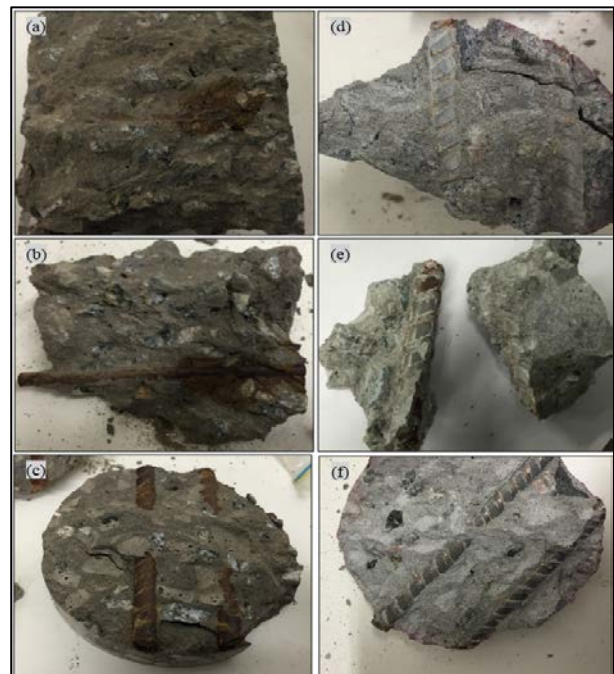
Rebar interface and reinforcement bar after 6 years of exposure, (a) typical rebar interface of GPC concrete specimen, (b) reinforcement bar in leg part of GPC culvert, (c) reinforcement bar in top slab of GPC culvert (d) typical rebar interface of OPC concrete specimen, (e) reinforcement bar in the leg part of OPC culvert, (f) reinforcement bar in the top slab of OPC culvert.
